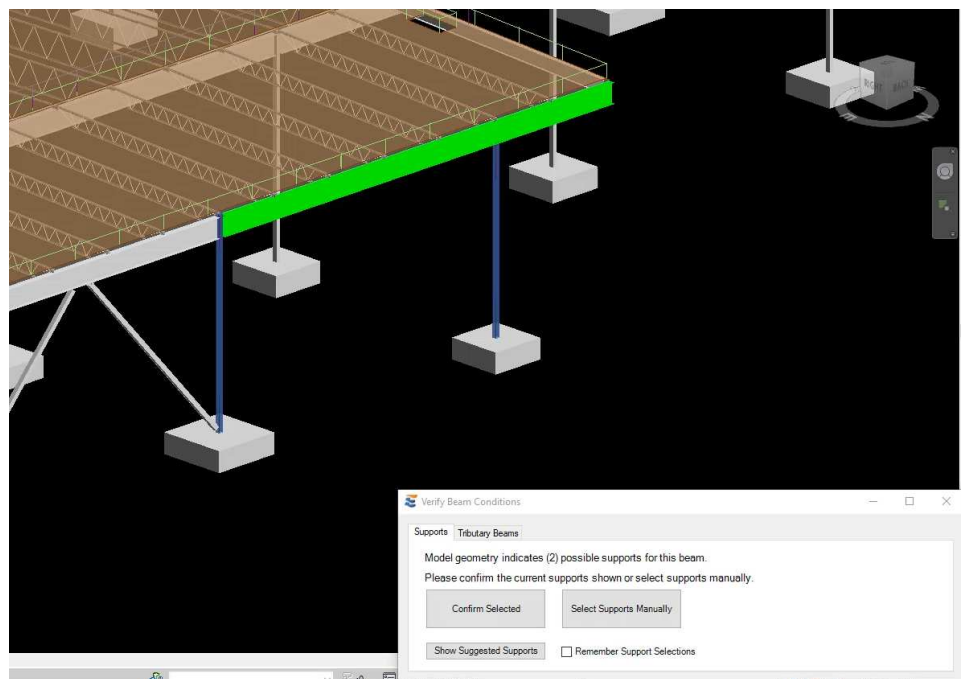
LAUNCHING OVERHANG GIRDER DESIGN
